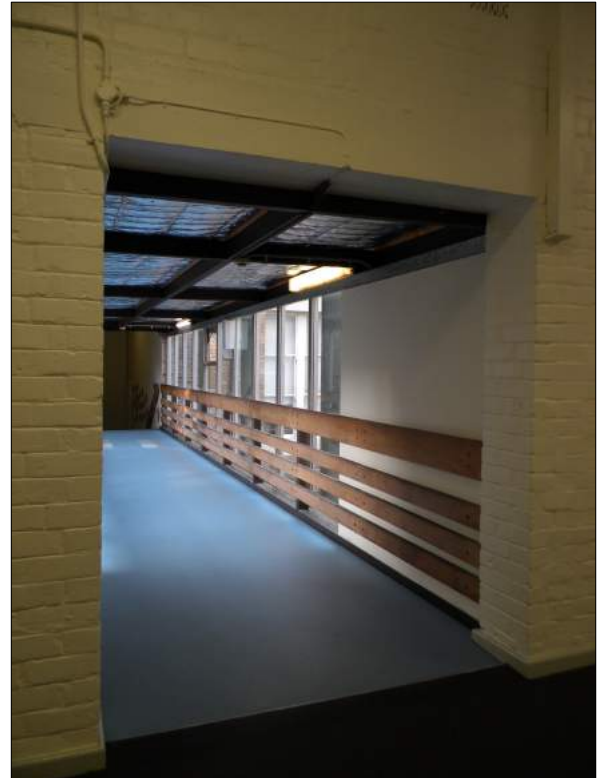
Room 159 in the CMP 2016. This room has painted brickwork walls and a timber lined ceiling.
